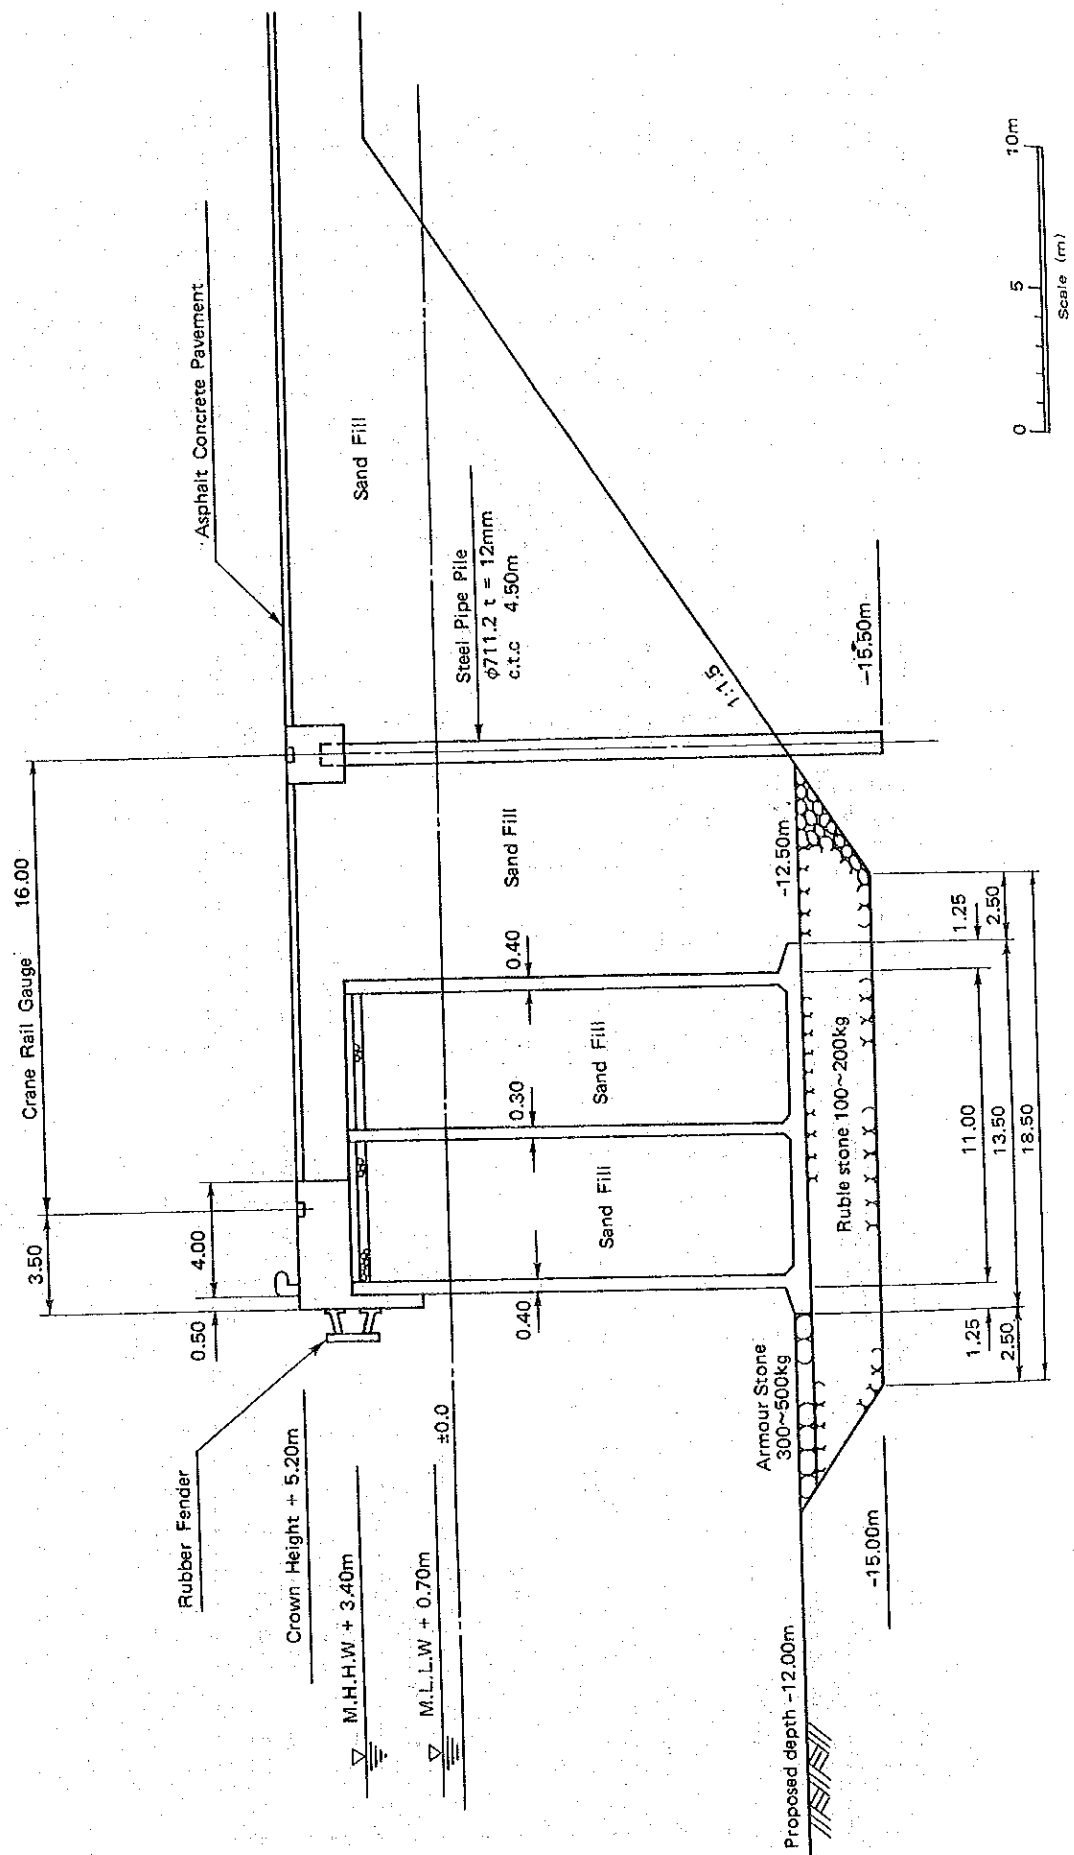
Port Qasim Container Berth Caisson Detail
